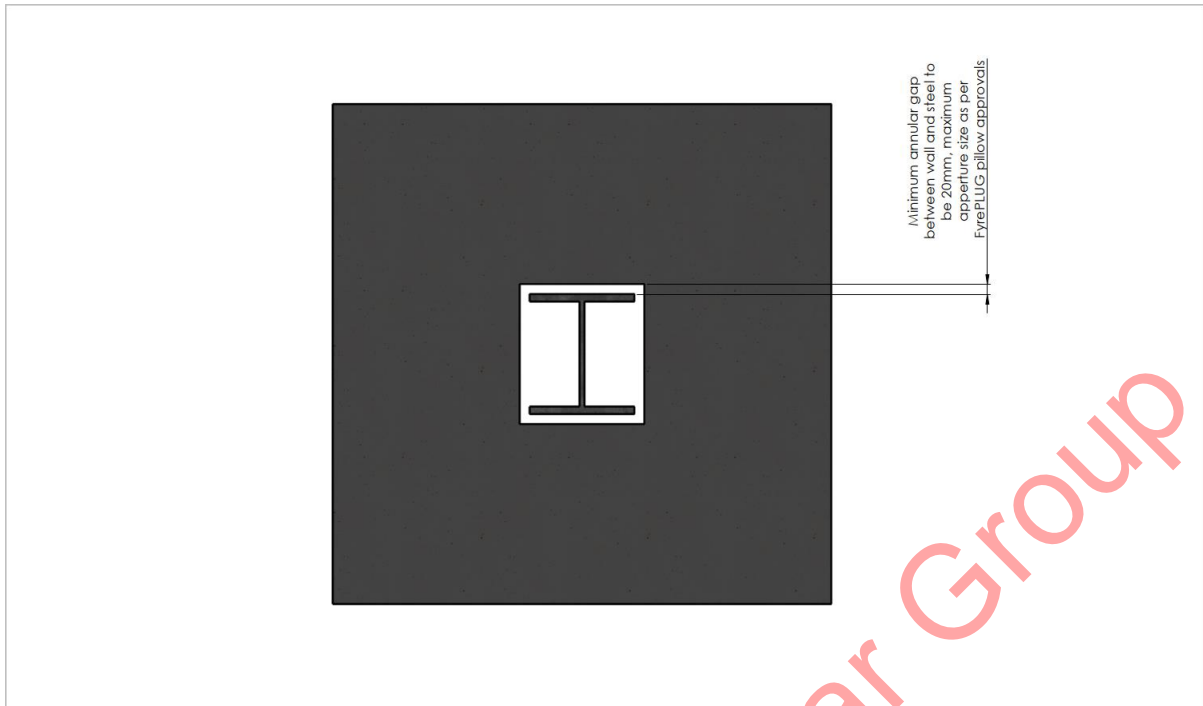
Proposed steel beam/purlin penetration system – minimum annular gap between wall and steel beam
